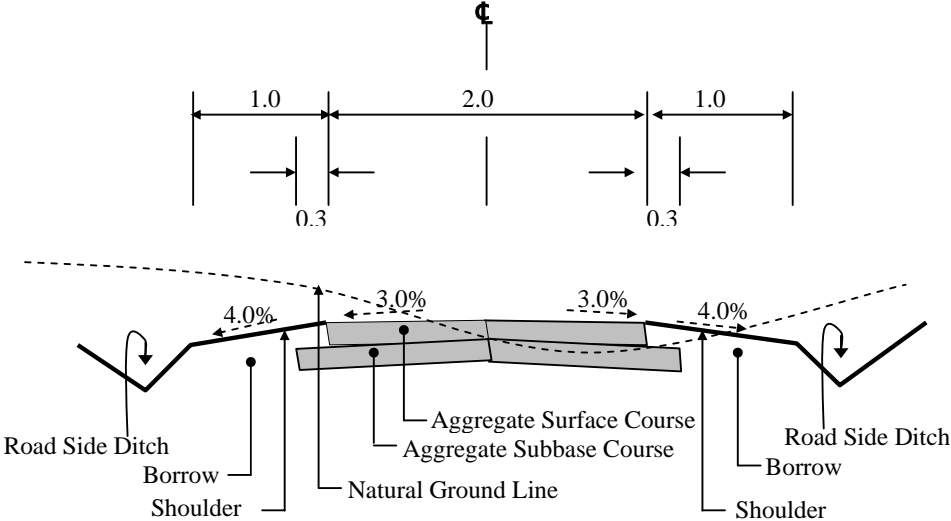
Typical Cross Section of One-Lane Gravel Road
